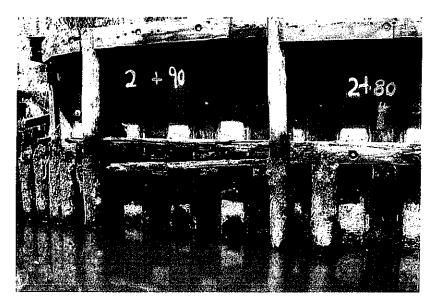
STA. 2+90 HOLES IN STEEL SHEETING
